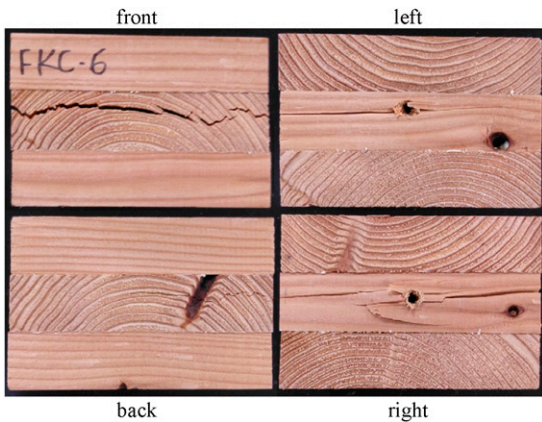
Typical crack failure mode on specimen K.F.CLT-C_6.
